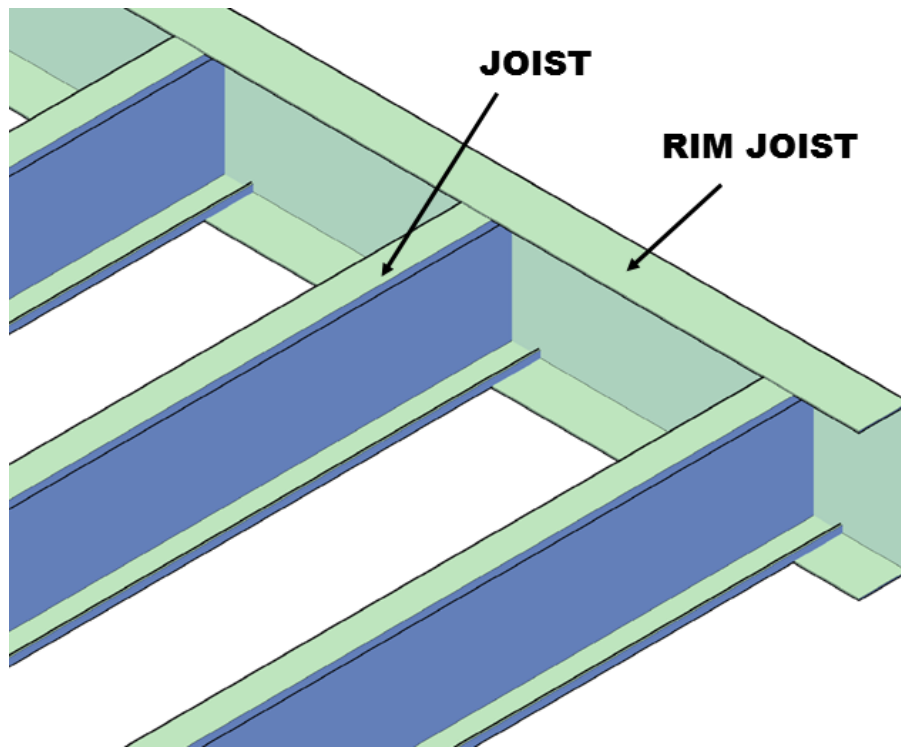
Illustration of Joist to Rim Joist Configuration
